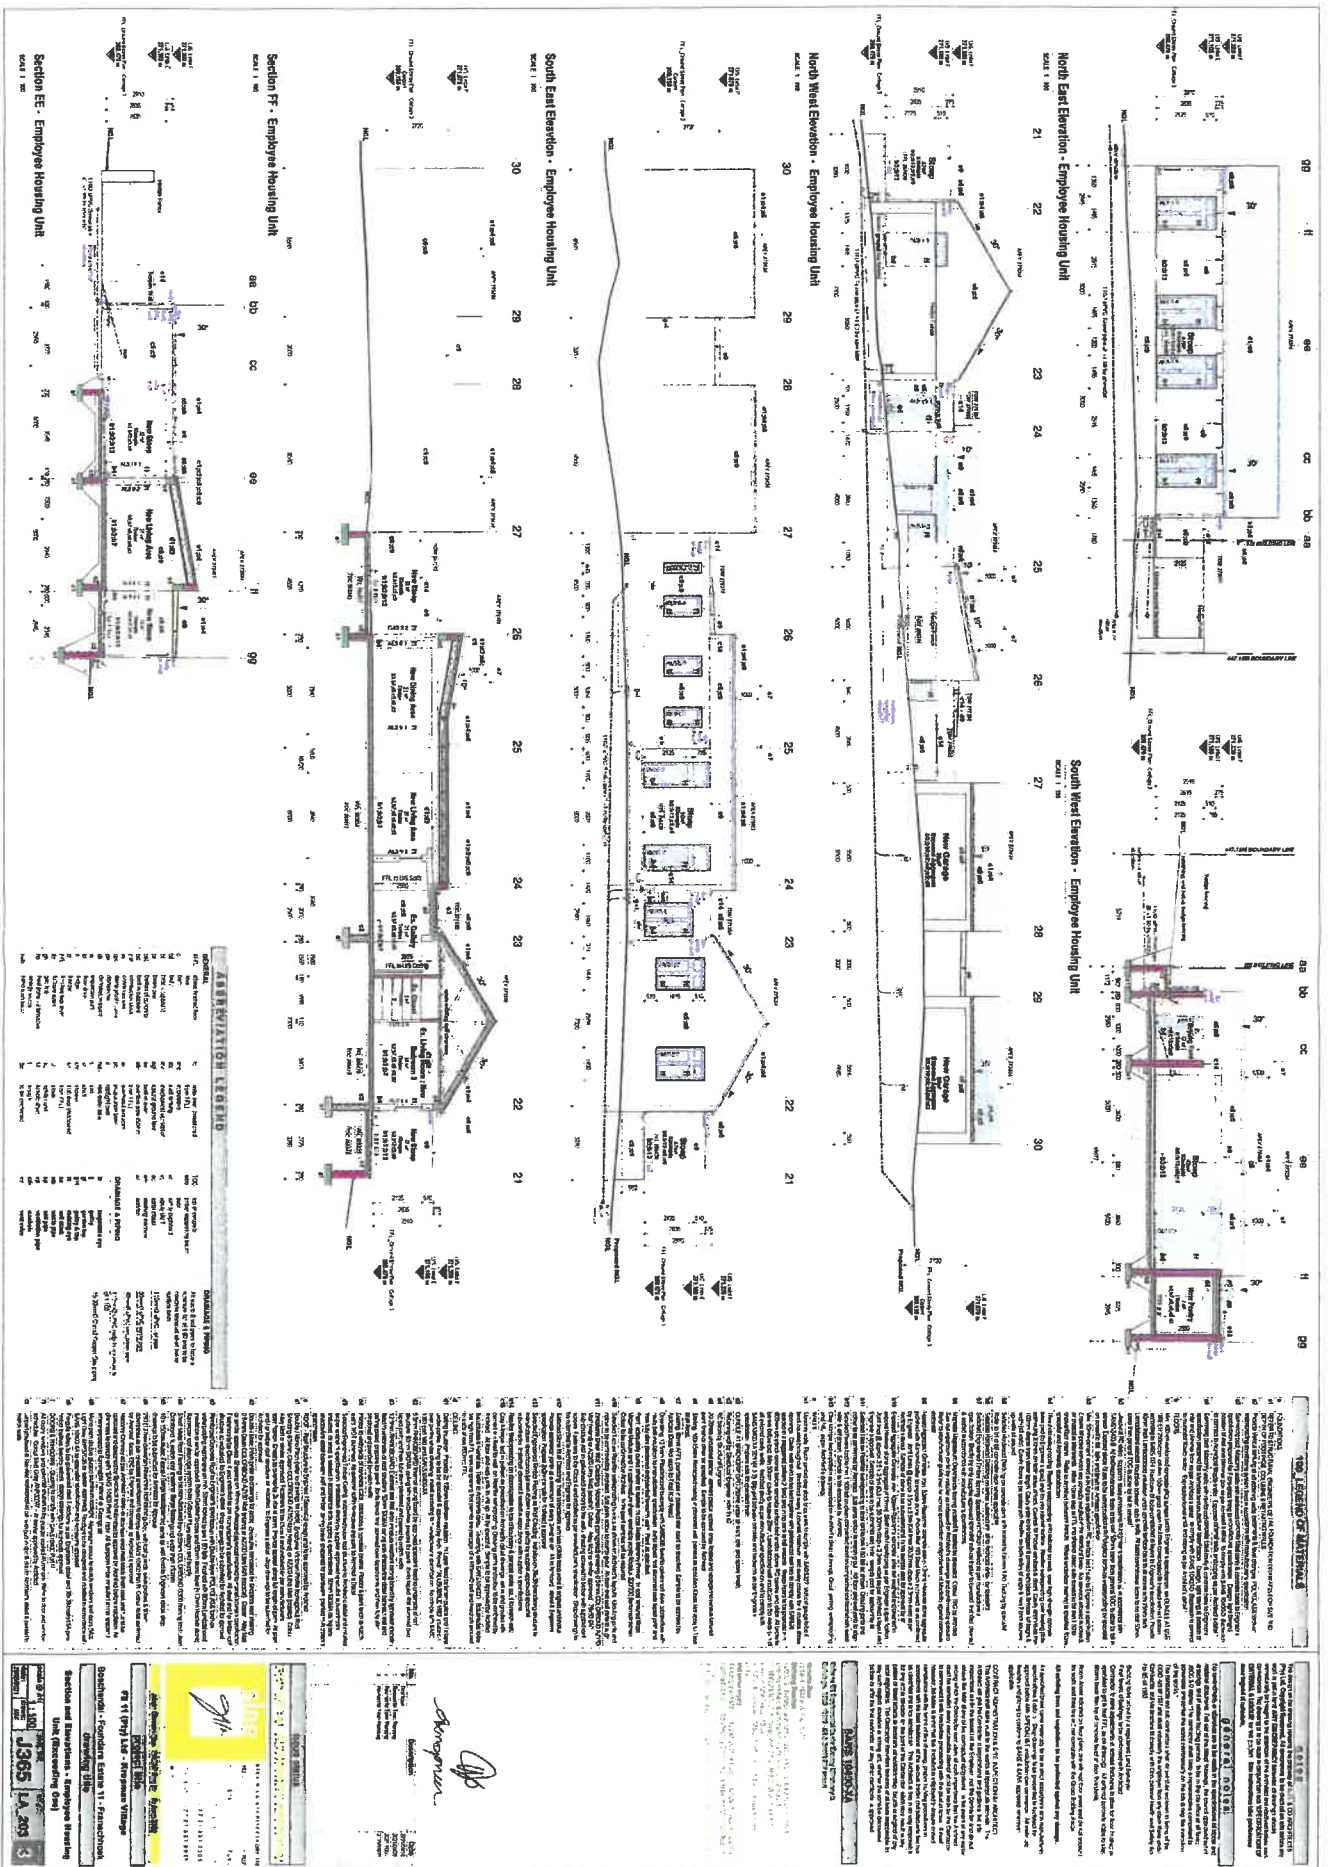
Employee Housing Unit (Exceeding one unit): Sections and Elevations (Source: Stee and co. architects)
